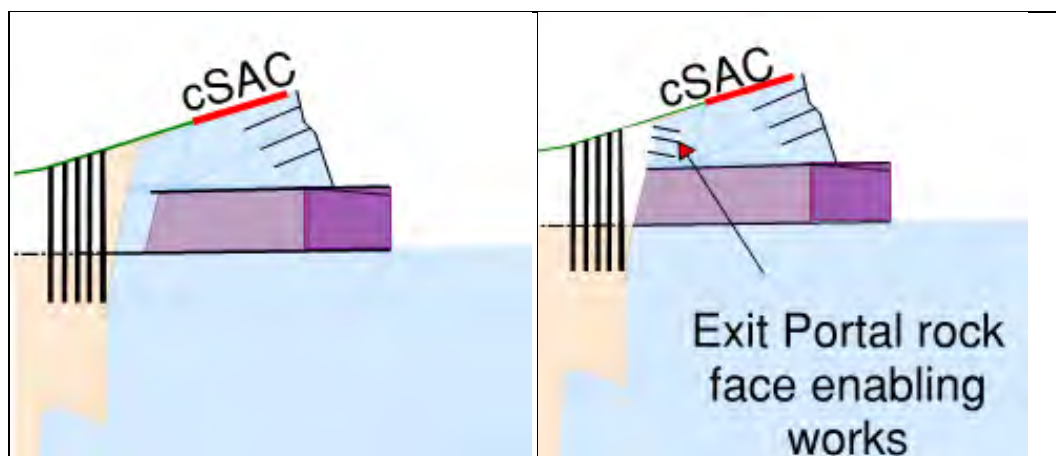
Schematic Lough Corrib cSAC Pinch Point at CH. 11+140
